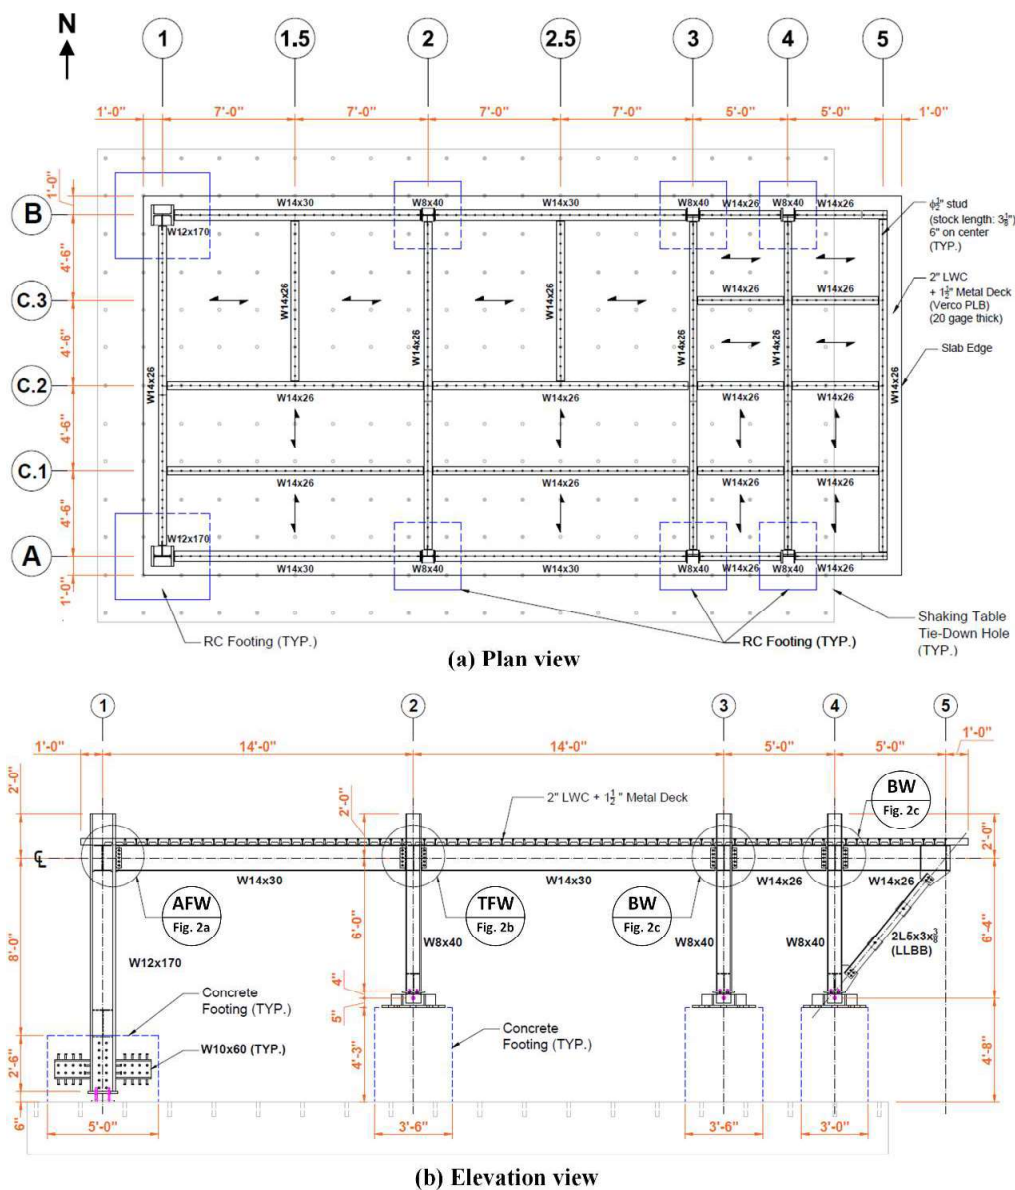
Phase 1 test frame: (a) plan view; and (b) elevation view
